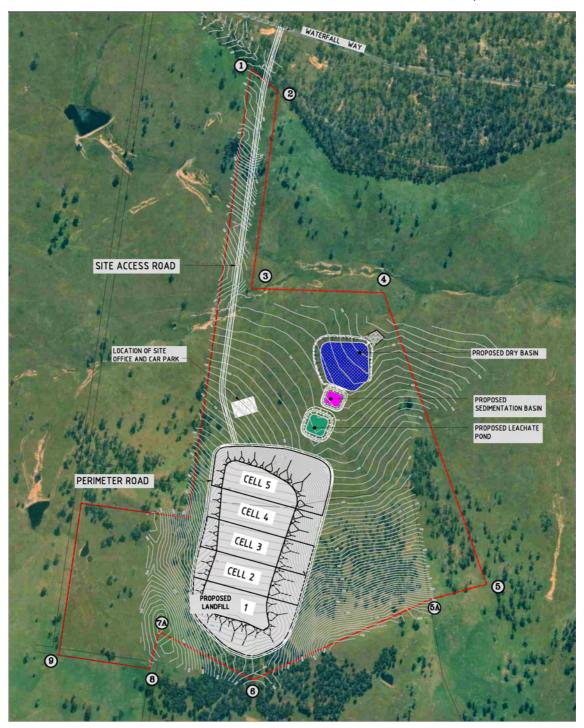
Indicative concept layout and landfill footprint of the proposed development (provided by AECOM)
